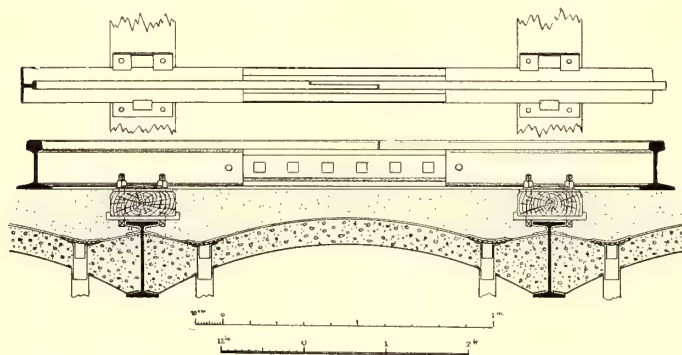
EASTERN SECTION, STANDARD FLOORING, LONGITUDINAL SECTION AT OUTSIDE RAILS, WITH PLAN OF RAILS
